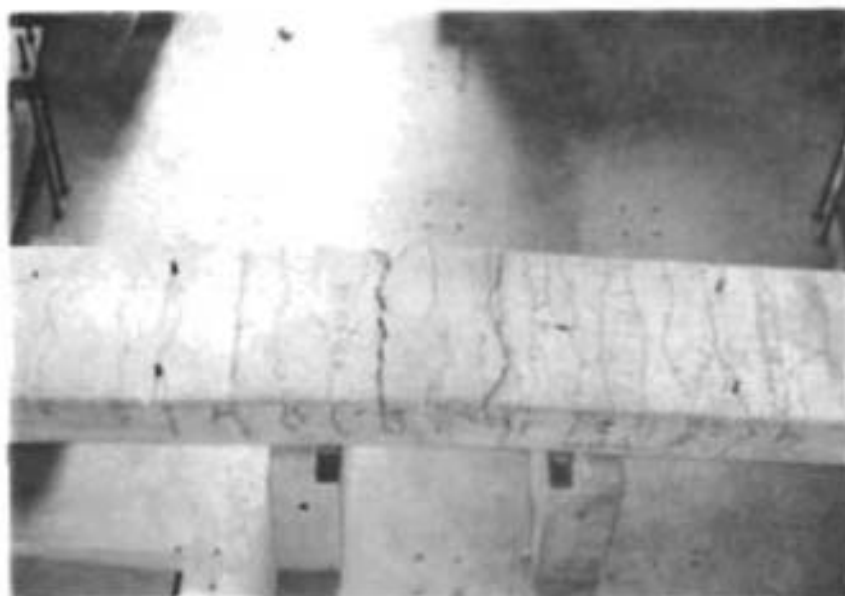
Tension face of 8-18-4/3/2-6/6 after failure
